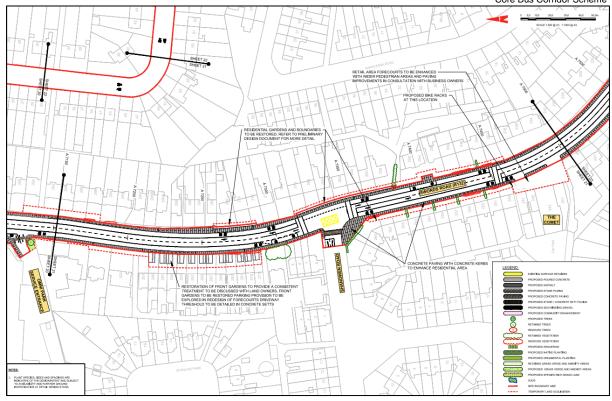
Proposed Landscape General Arrangement at the Comet (Sheet 21)
